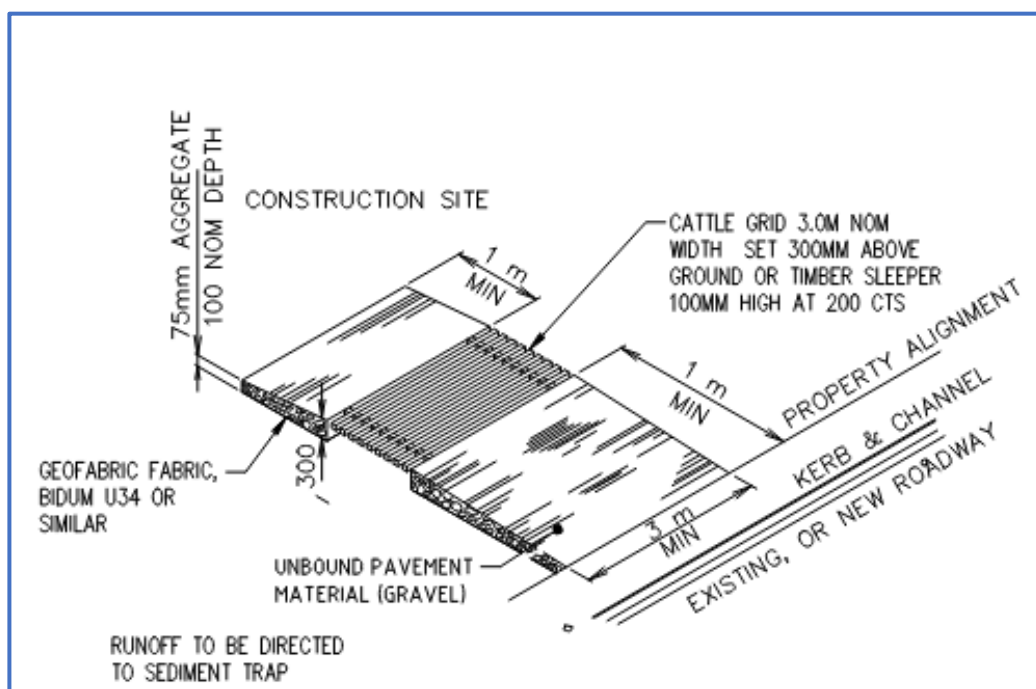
Temporary Construction Vehicle Entry/Exit Sediment Trap
